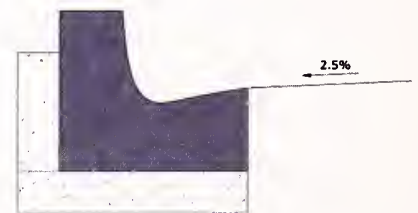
A Standard Design of Concrete Kerb and Channel
